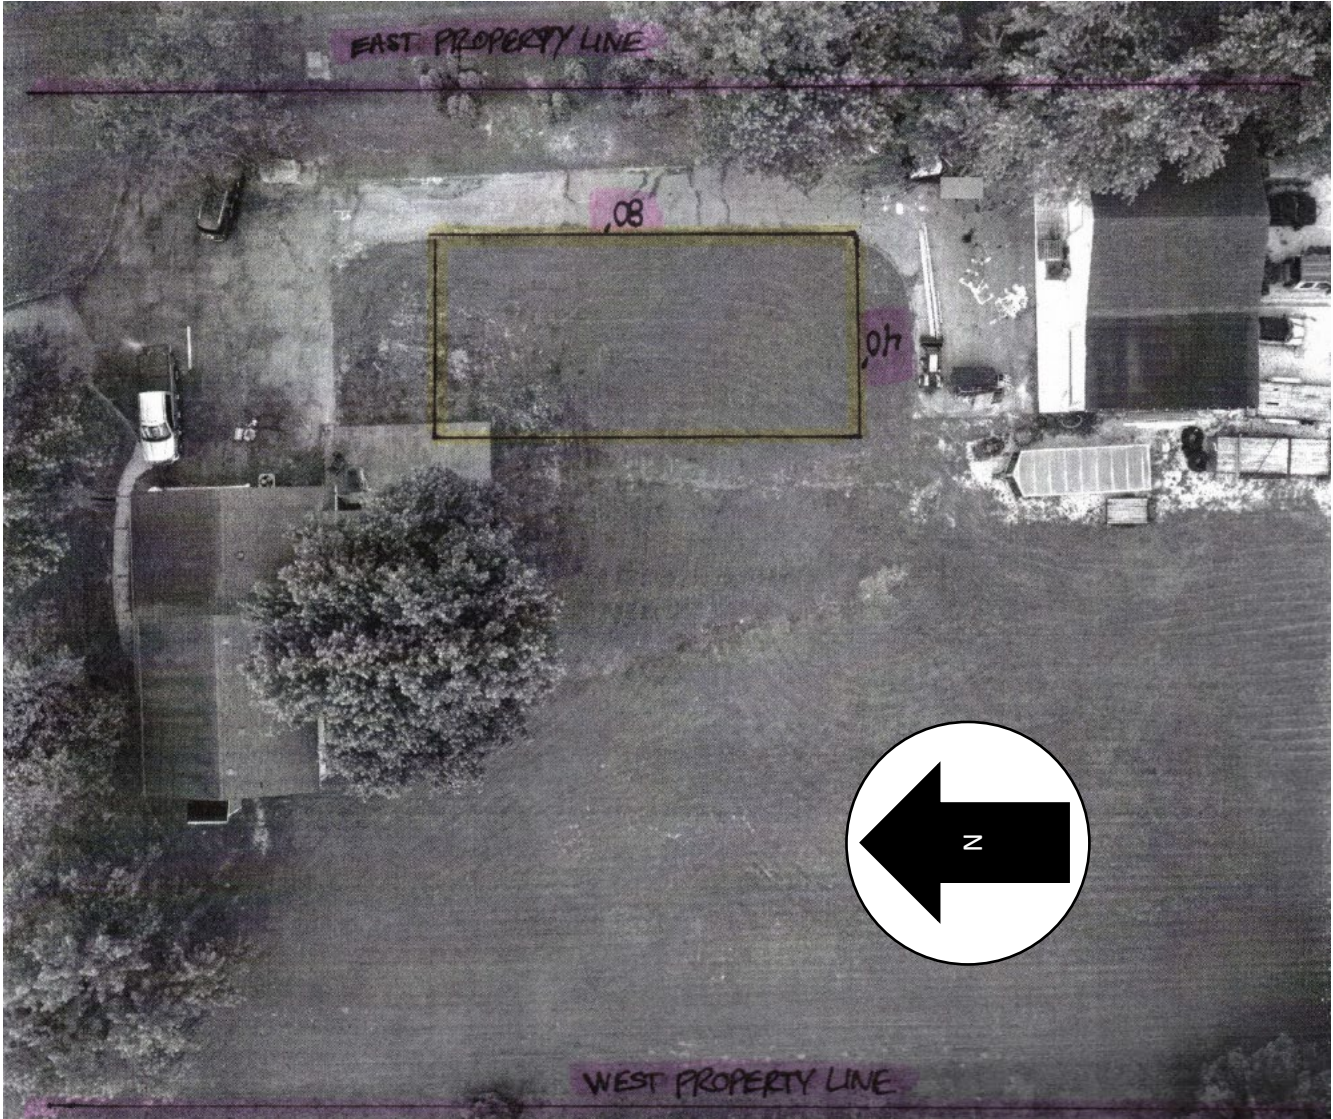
Site plan for the proposed barn at 9621 E 96<sup>th</sup> Street.
